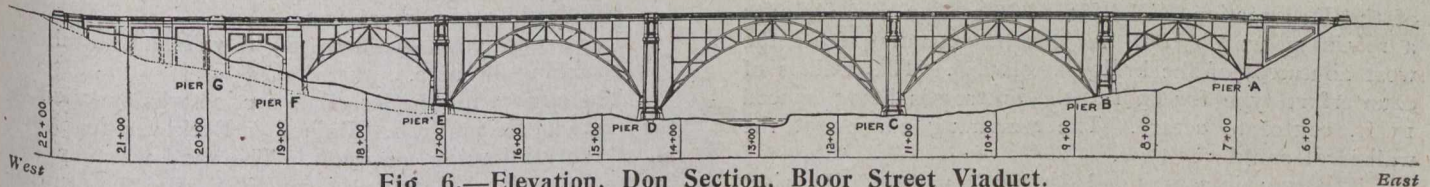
Elevation, Don Section, Bloor Street Viaduct.
